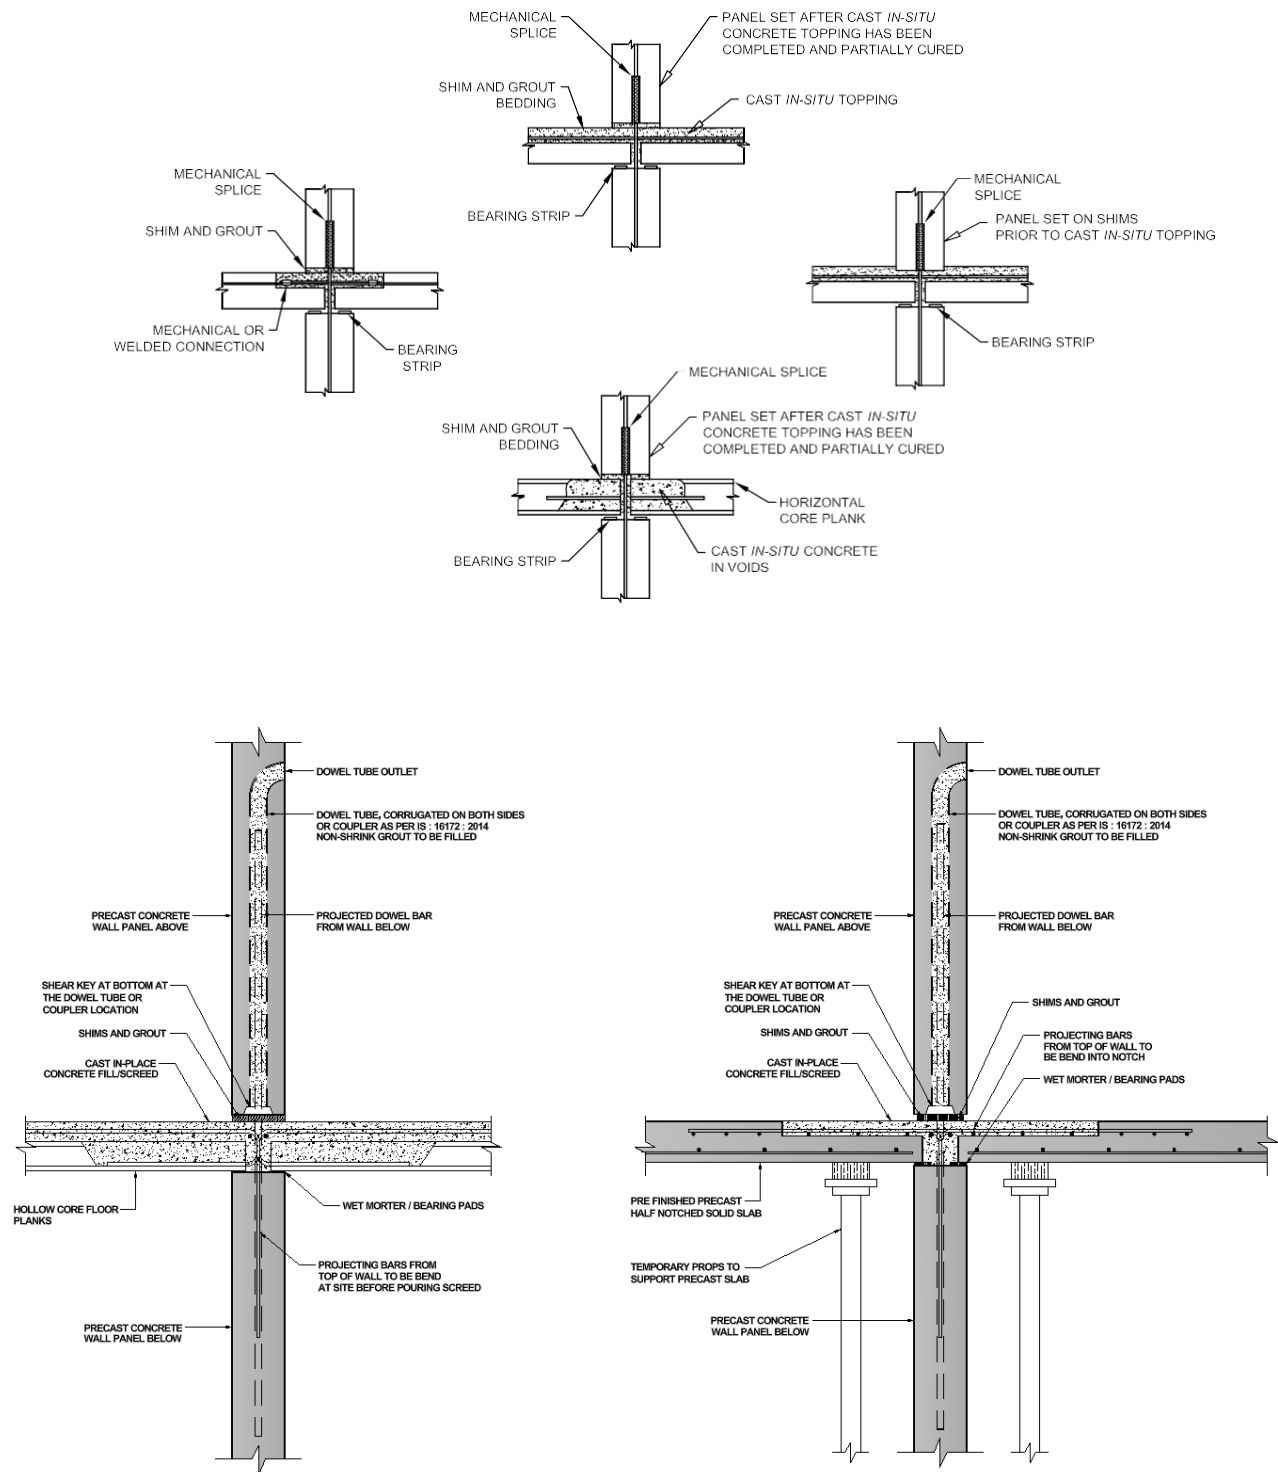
DIFFERENT TYPES OF MECHANICAL SPLICES FOR CONNECTION OF VARIOUS CONFIGURATIONS OF PRECAST WALL AND FLOORS
